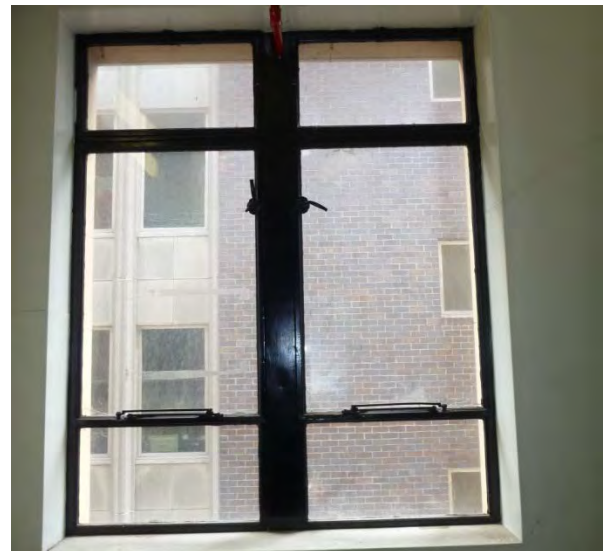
Original windows in the Wynyard Lane fire stairs of the former Shell House. (Source: GML 2014)
